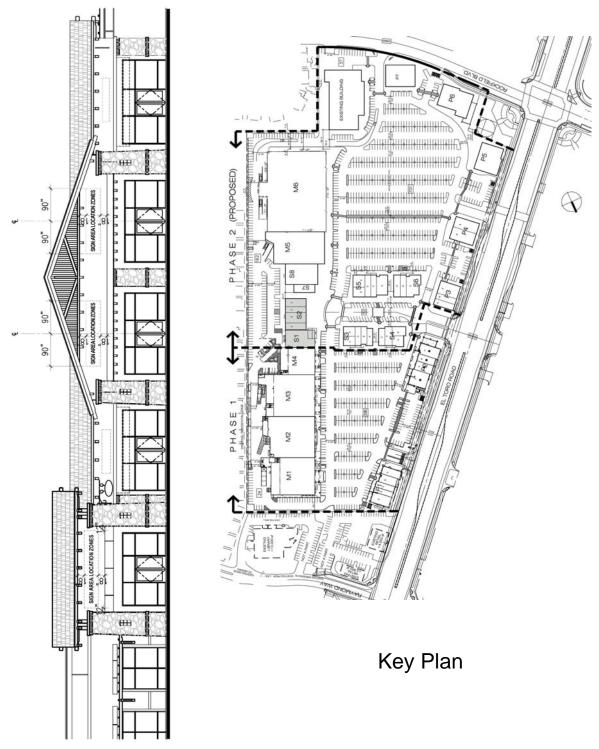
In line Shops Front Elevation (no signs allowed at rear elevations)
